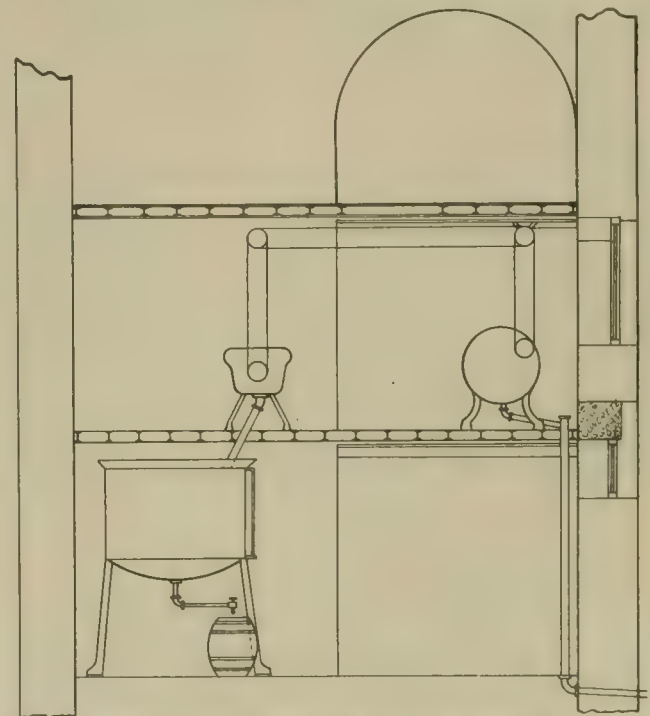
FIG. A LONGITUDINAL SECTION WASTE WASHING PLANT SEATTLE ELECTRIC CO.
